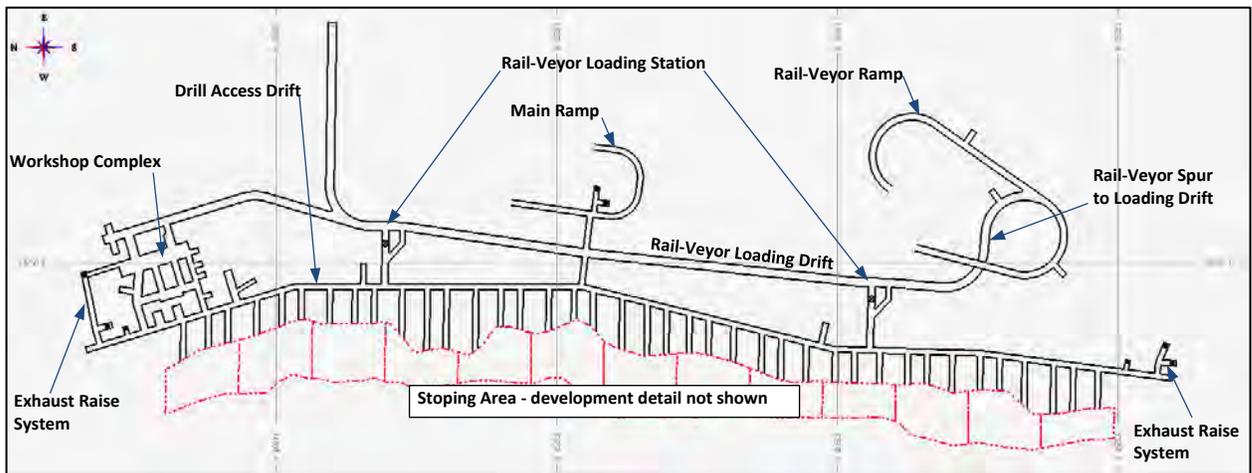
Plan View of U/G Mine with Transparent Open Pit
